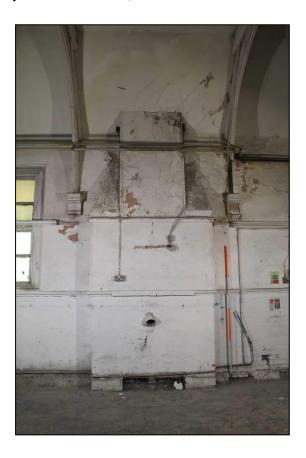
Room 3a western chimney breast: view north, scale: 2m
